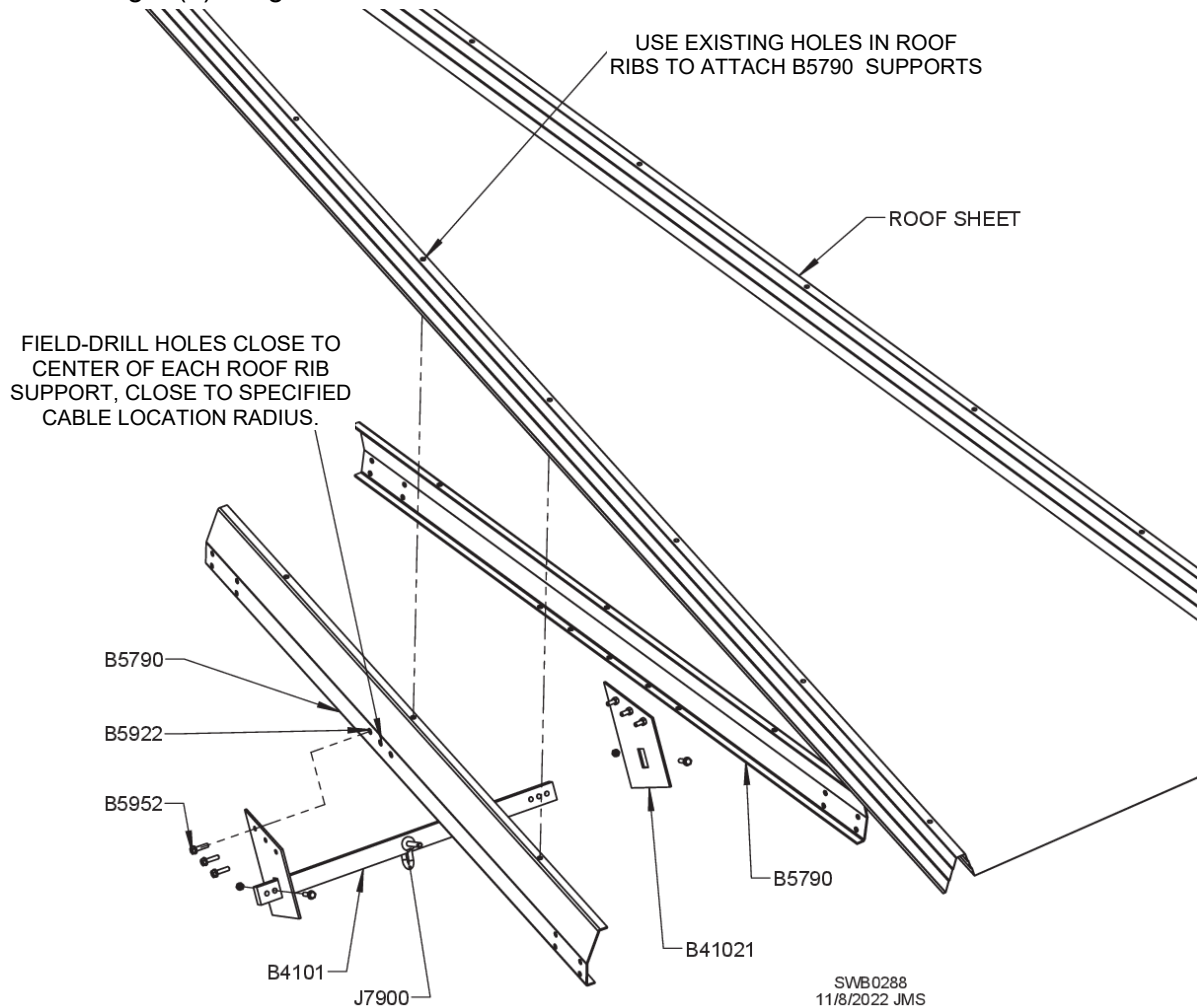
Installing temp cable support package B41001 for 24' to 48' dia. bins
